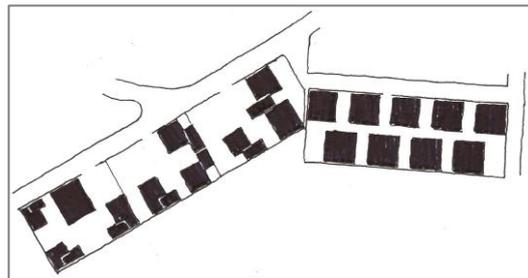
Site Plan,Sahand Housing Project (Sketched by the author).
